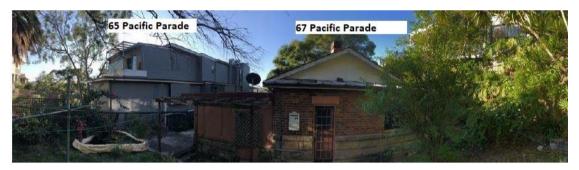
Details the eastern elevation of 65 Pacific Parade facing the subject site. The eastern elevation of 65 Pacific contains only secondary windows (with one ground floor level window with fixed louver screening) with a lift core and stairwell.
